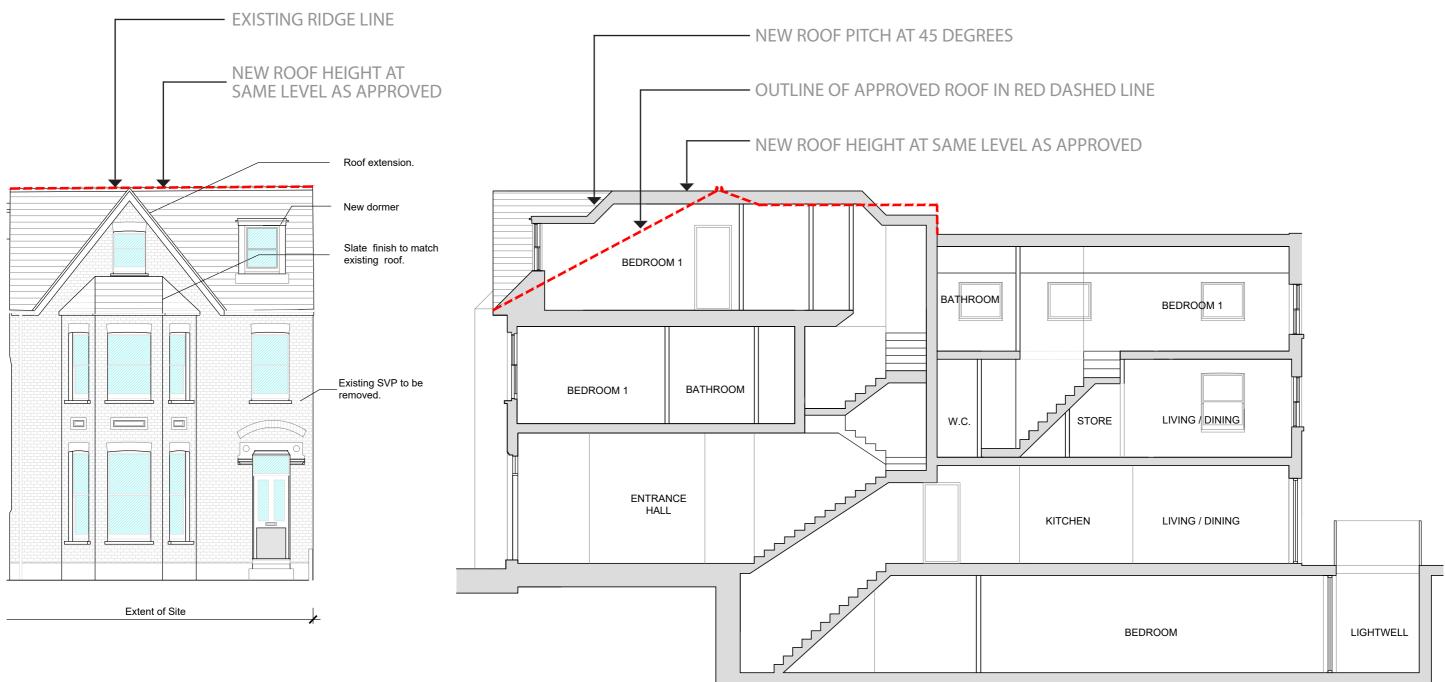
PROPOSED FRONT ELEVATION AND SECTION
